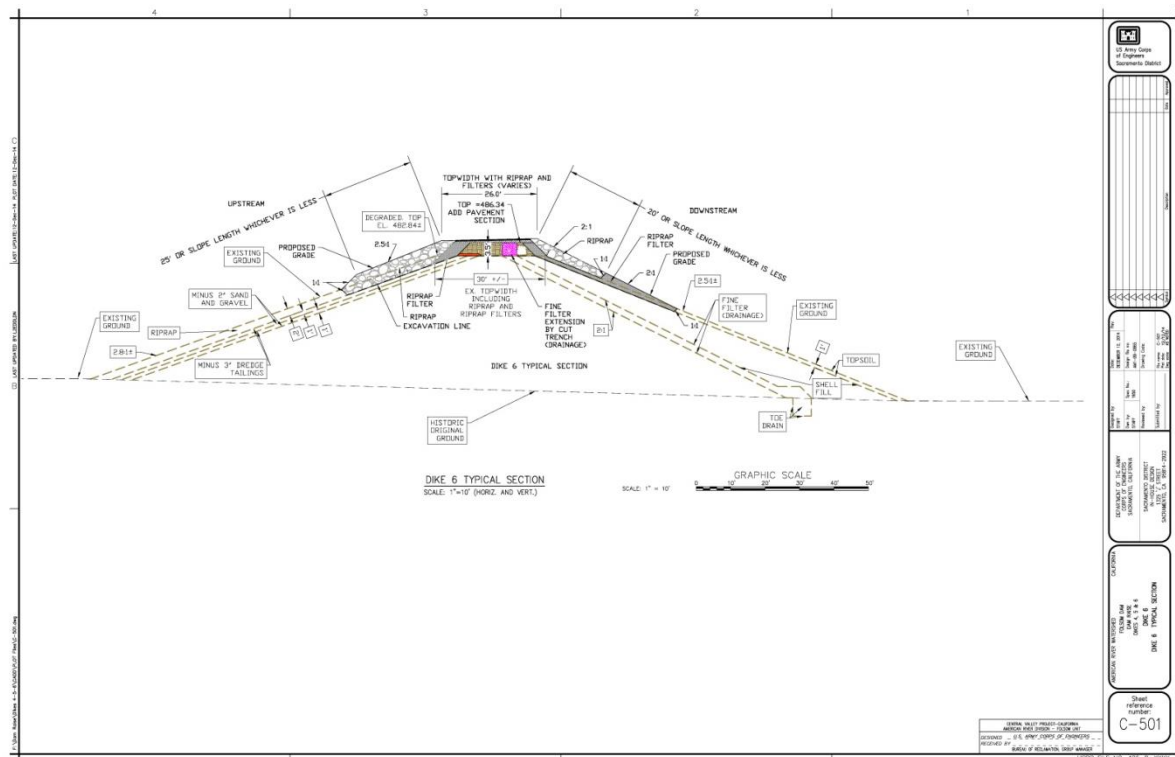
Example Cross Section of A 3.5-foot Earthen Dike Raise.
